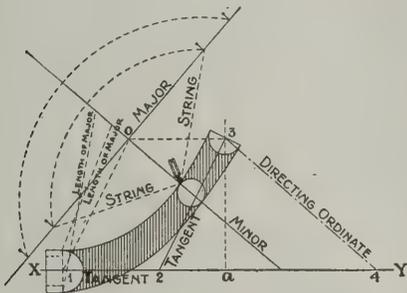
Showing How Stairbuilders Generally Draw a Face Mold with String and Pins
